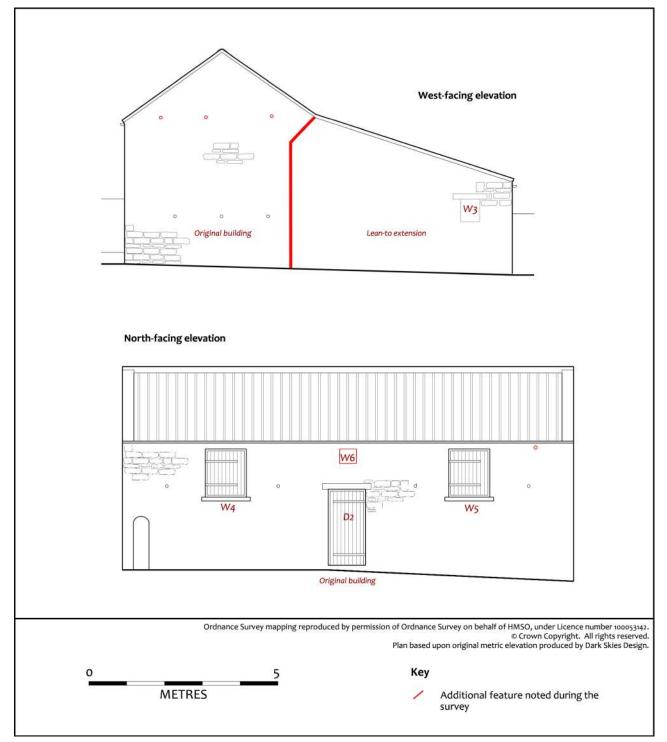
The west and north facing external elevations, based upon drawings by Dark Skies Design
